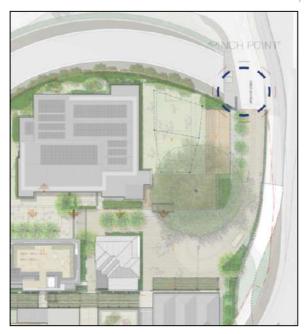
Identified 'Pinch Point' in northeast of the site, around Bradfield Tunnel Services Building and site access from Upper Fort Street (Source: FJMT 2020)
